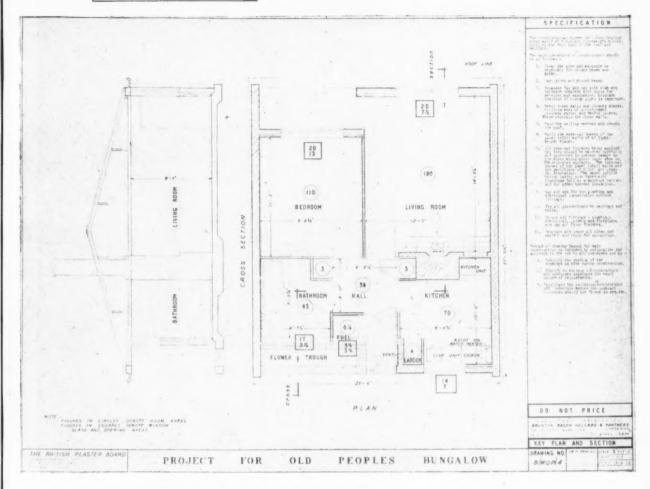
"Key Plan and Section" sheet provided for the builder's general guidance, but not to be used for pricing. For a typical sheet devoted to one element only, see Fig. 3.
